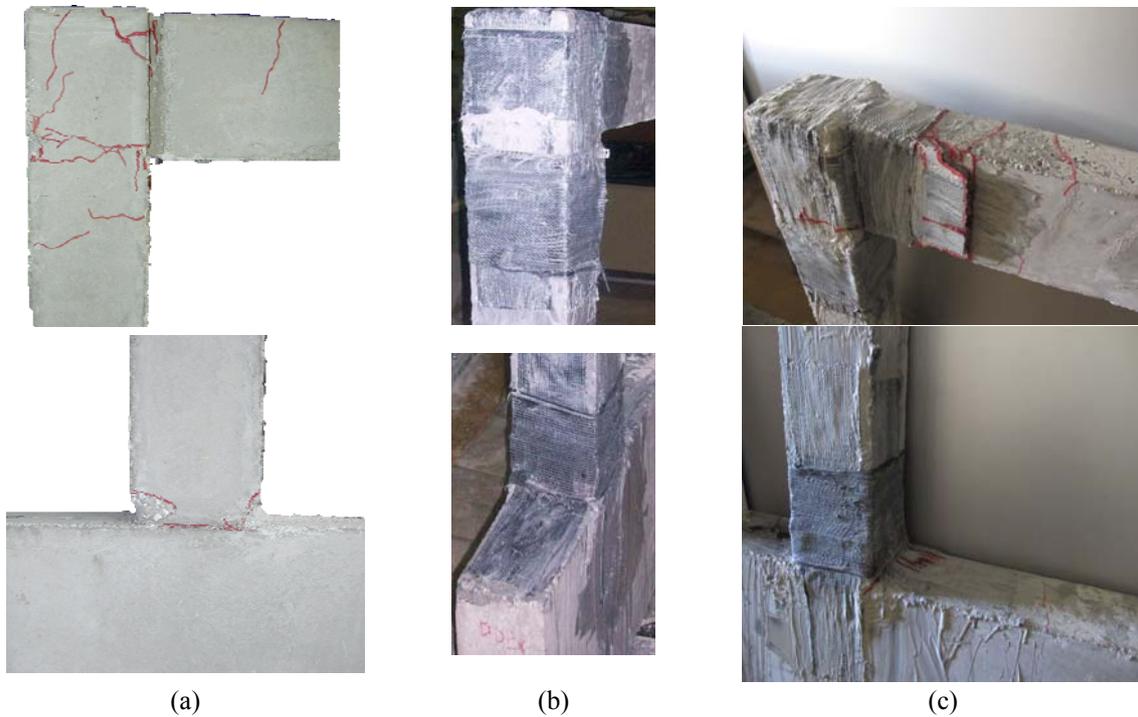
(a) Joint regions cracking configuration of original specimen F; (b) The applied repair procedure with sheets; (c) Joint regions cracking configuration of repaired specimen RF
